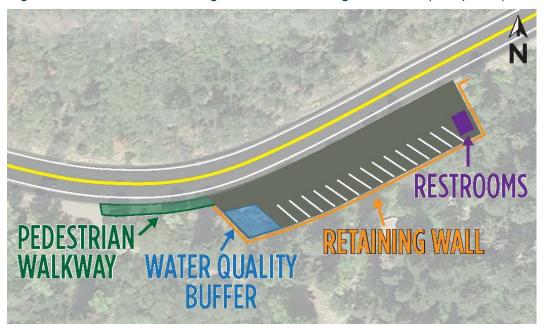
Trailhead Parking Alternatives – Bridge Trailhead (15 Spaces)
